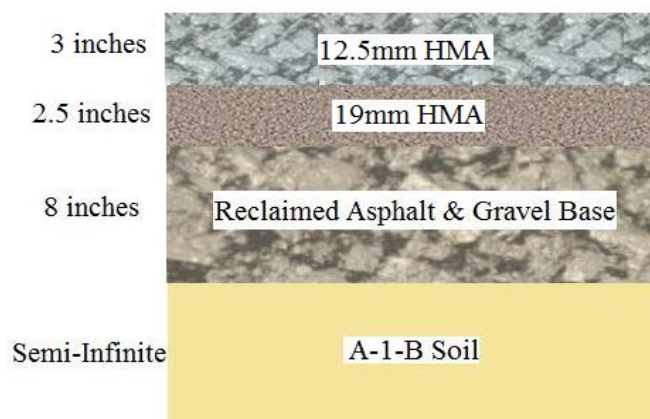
Dunn's Corner Road Cross-Section (Analyzed with DGA HMA Mixture).
